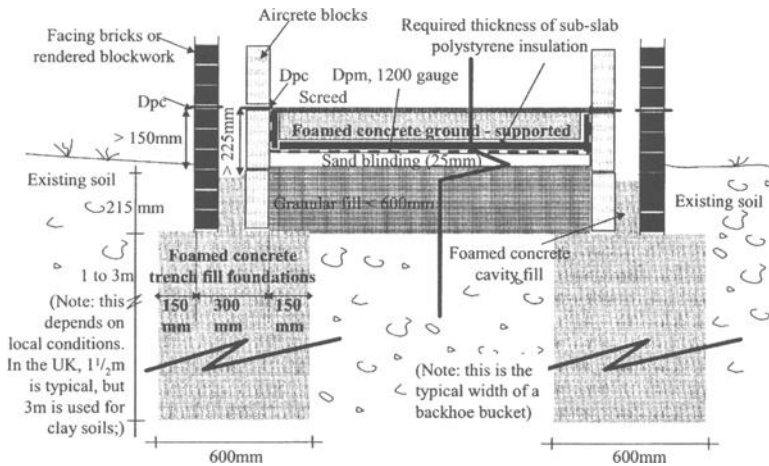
Section drawing of proposed foamed concrete trench fill foundations and ground slab typical of UK house building construction [8].
